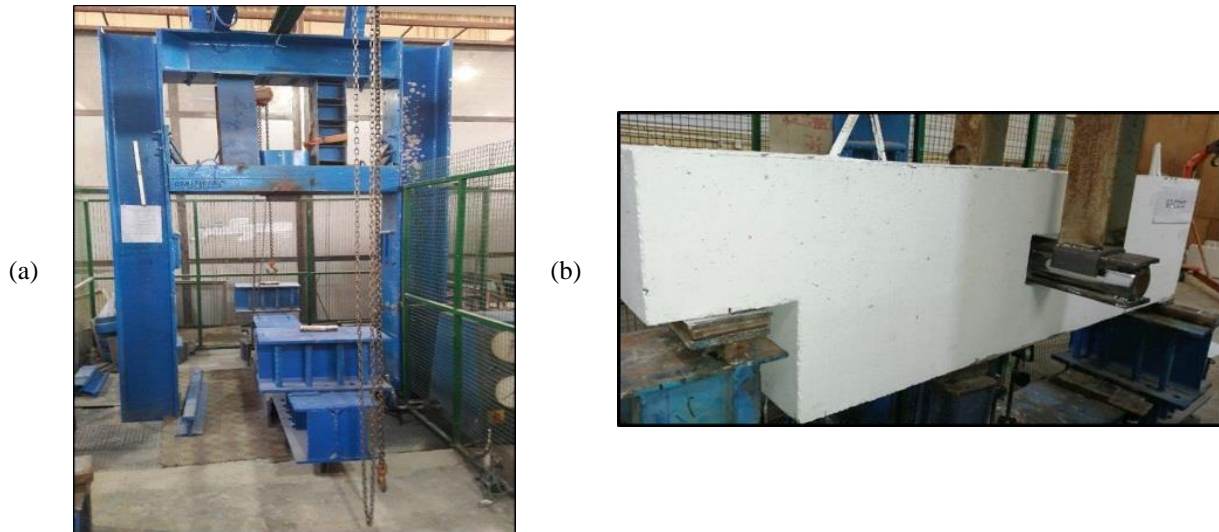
Loading setup (a) The testing machine (b) specimen under test
